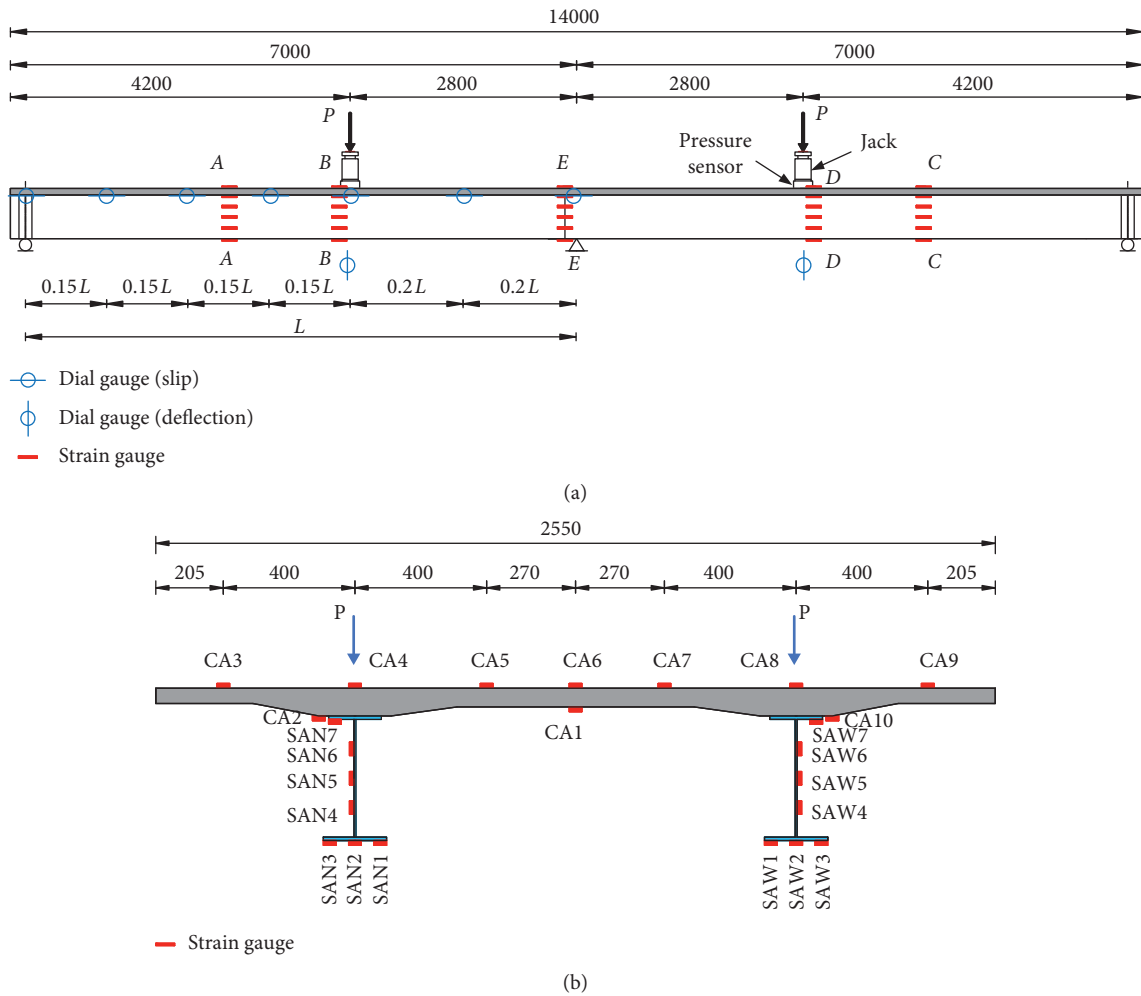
Schematic of the loading setup and instrumentation (unit: mm). (a) Vertical deflection and interface slip. (b) Layout of strain gauges on the steel girder and concrete slab (section A).
